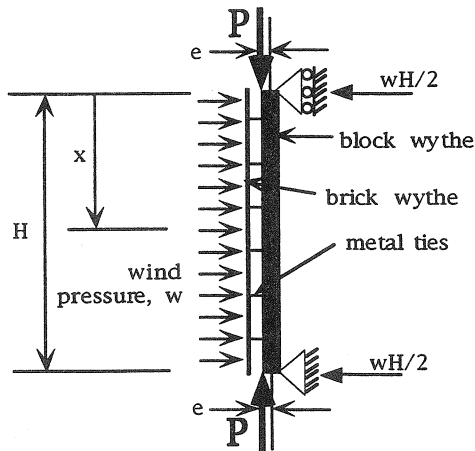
Typical Applied Loads to a Double Wythe Masonry Wall.
